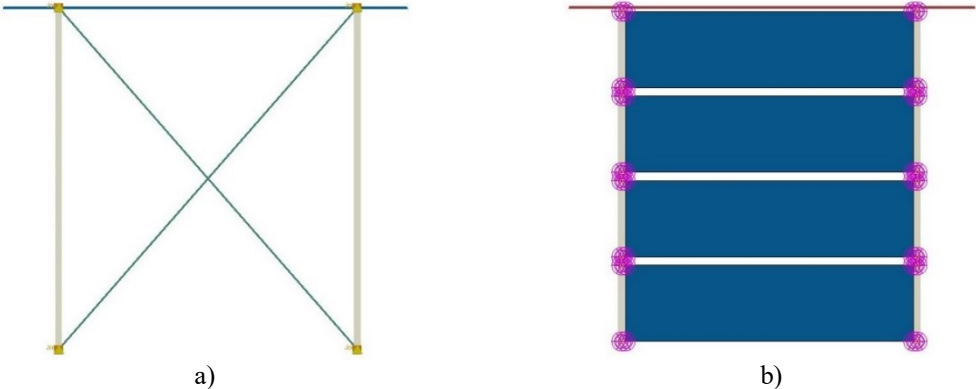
Frame stabilized with a) bracings, b) sandwich panels
